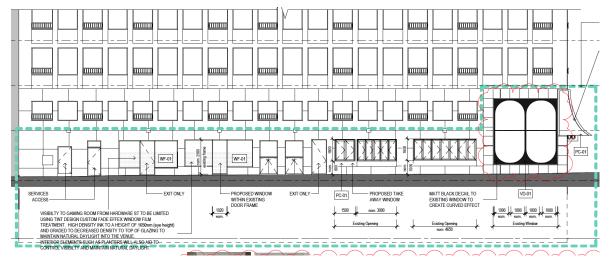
Proposed works at ground level along the Hardware Street frontage. From Drawing TP12
